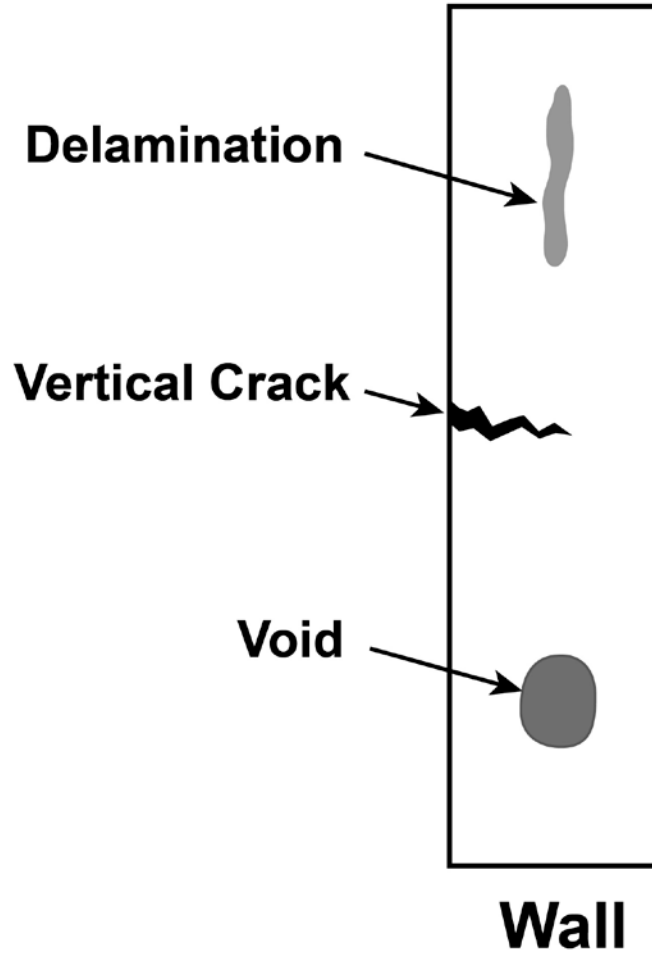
Figure I. Illustration of Delamination, Void, and Vertical Crack in a Concrete Wall Specimen
